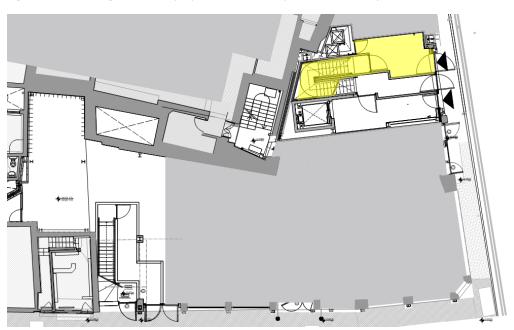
Plan showing the current proposed ground floor layout including the Madame Jojo's entrance
